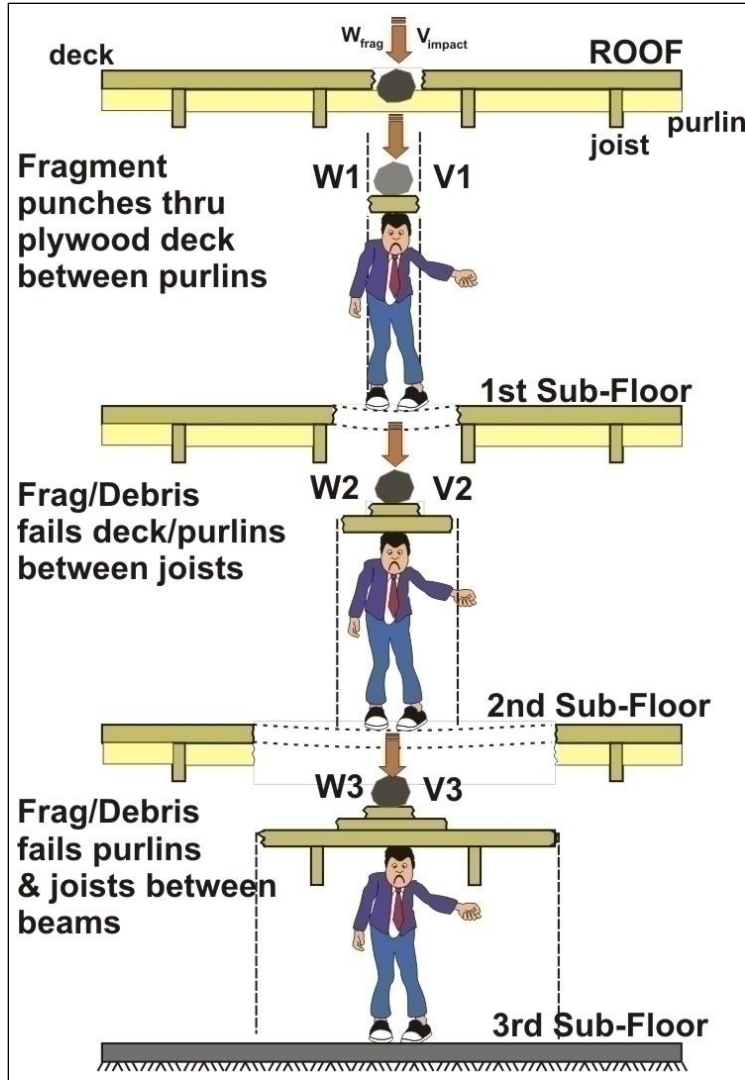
Example of Fragment Penetrating Multiple Floors of a Structure
